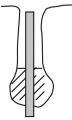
Pile penetrates the grouted base and fails (punching failure).
